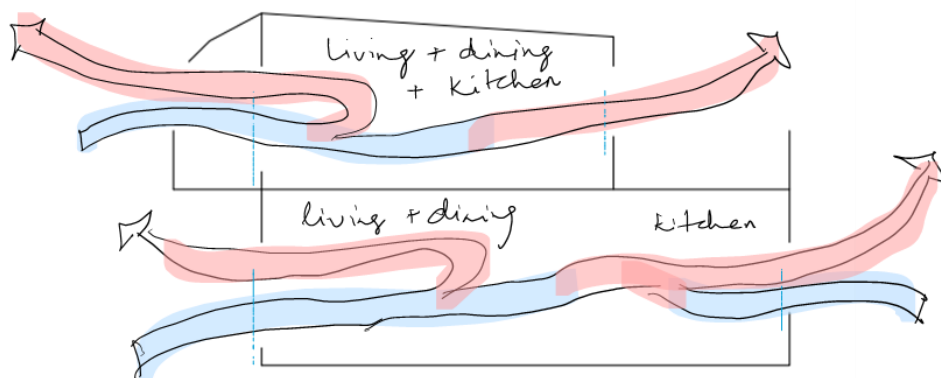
Section through one + two-bedroom home showing cross ventilation
